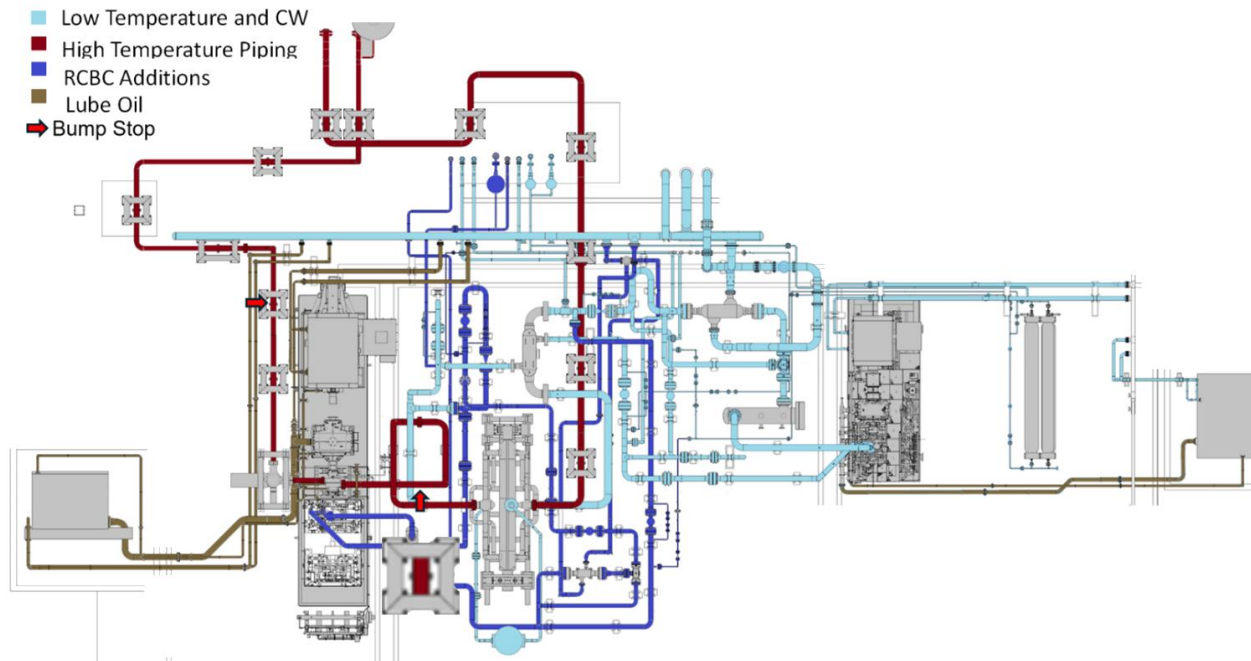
ORIGINAL BUMP STOP LOCATIONS IN PIPING SYSTEM DESIGN [9]
